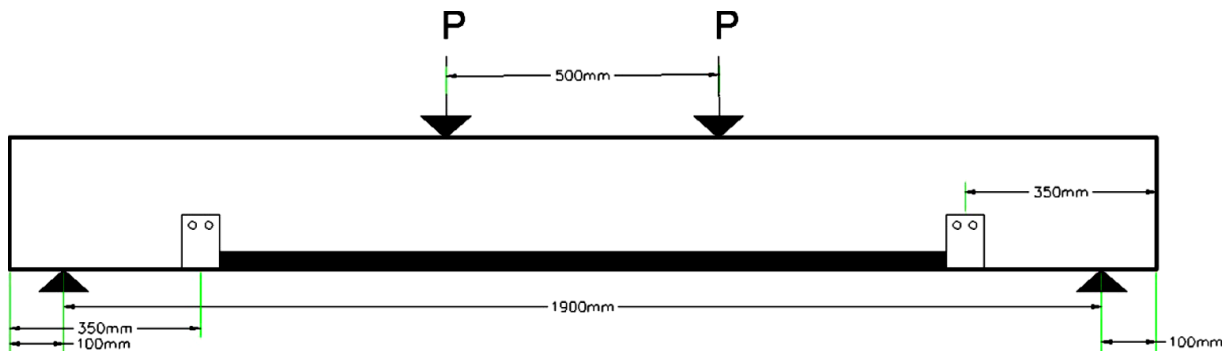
Beam details of the specimen used by Abdullah & Rafiq [3].
